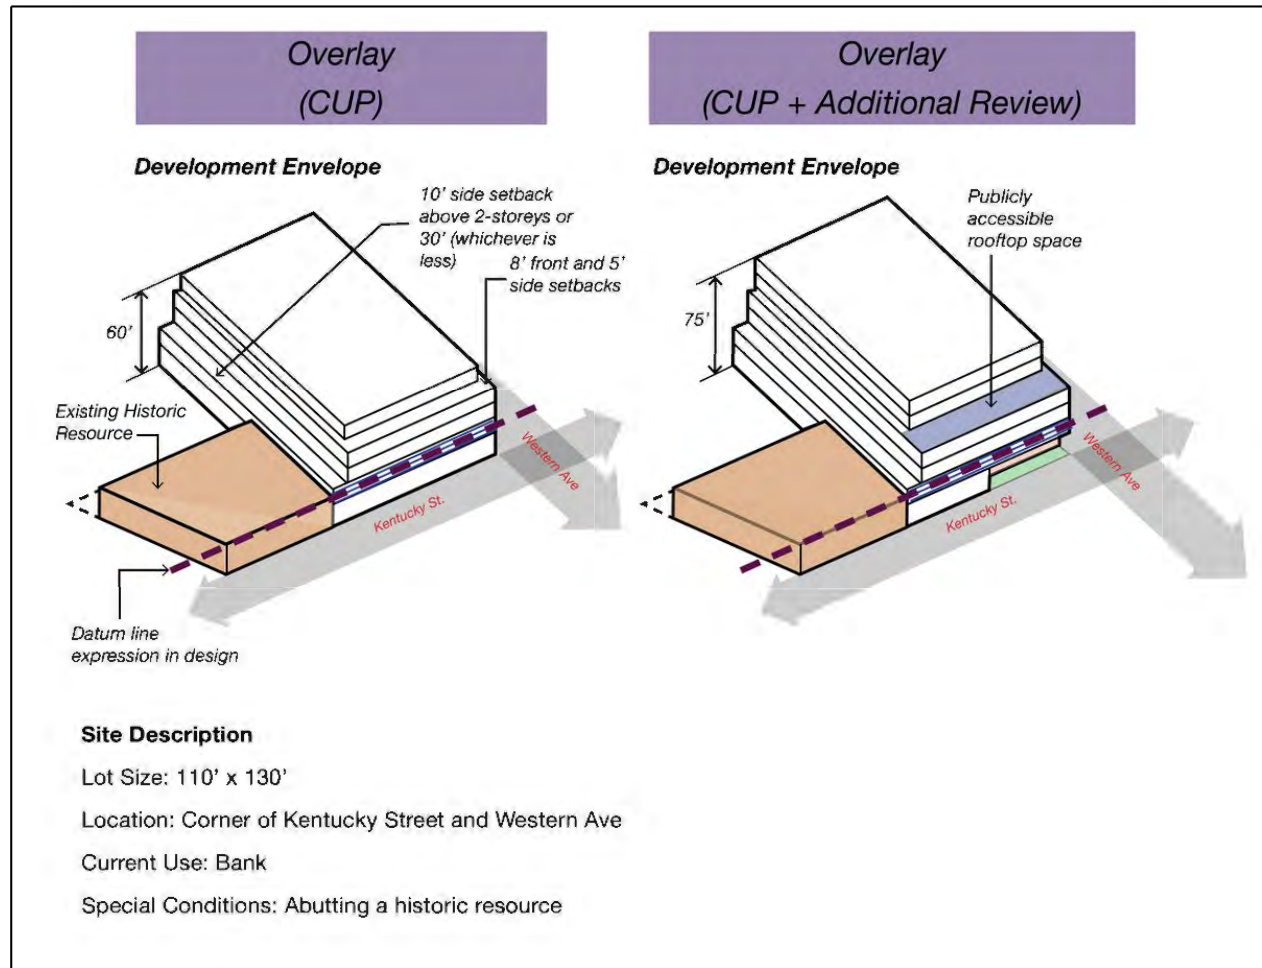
Treatment of new construction adjacent to a historic building, July 2023
